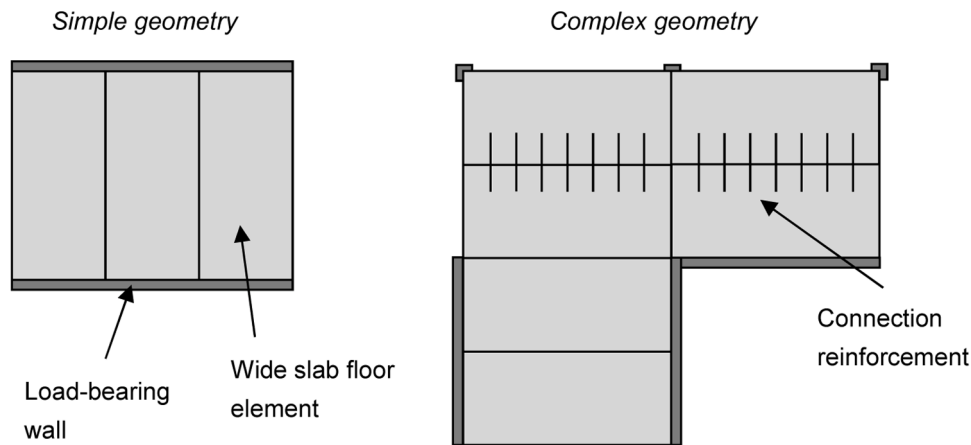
Schematic top view of wide slab floor layouts: a simple geometry spanning wall-to-wall (left), and a complex geometry where connection reinforcement is required (right).
